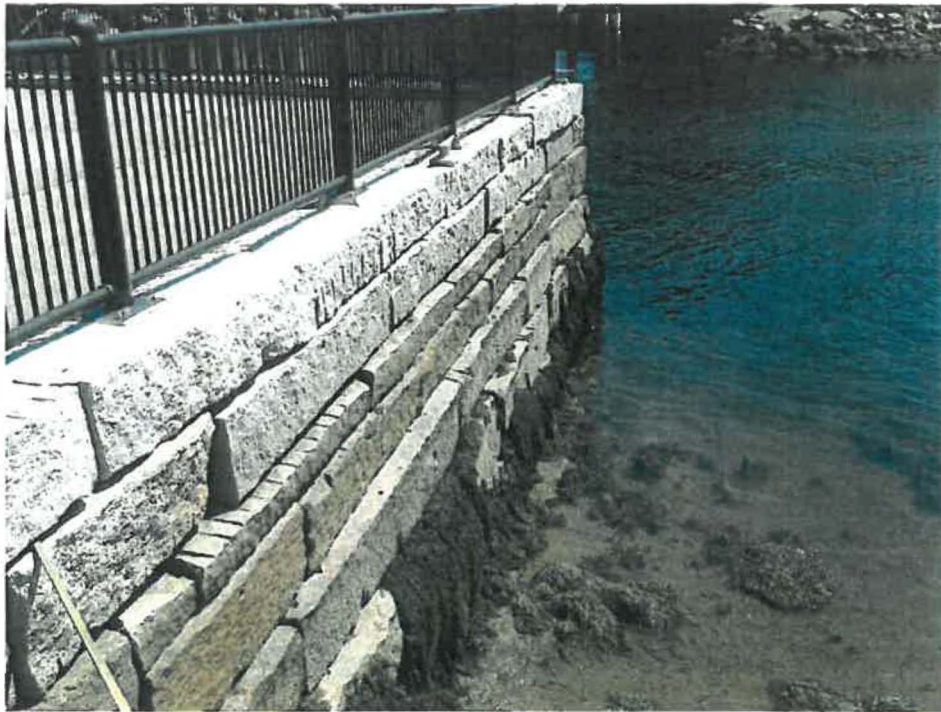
View of the proposed location of the landing and gangway access to the proposed floating docks, looking north, taken on 6-24-2019.
